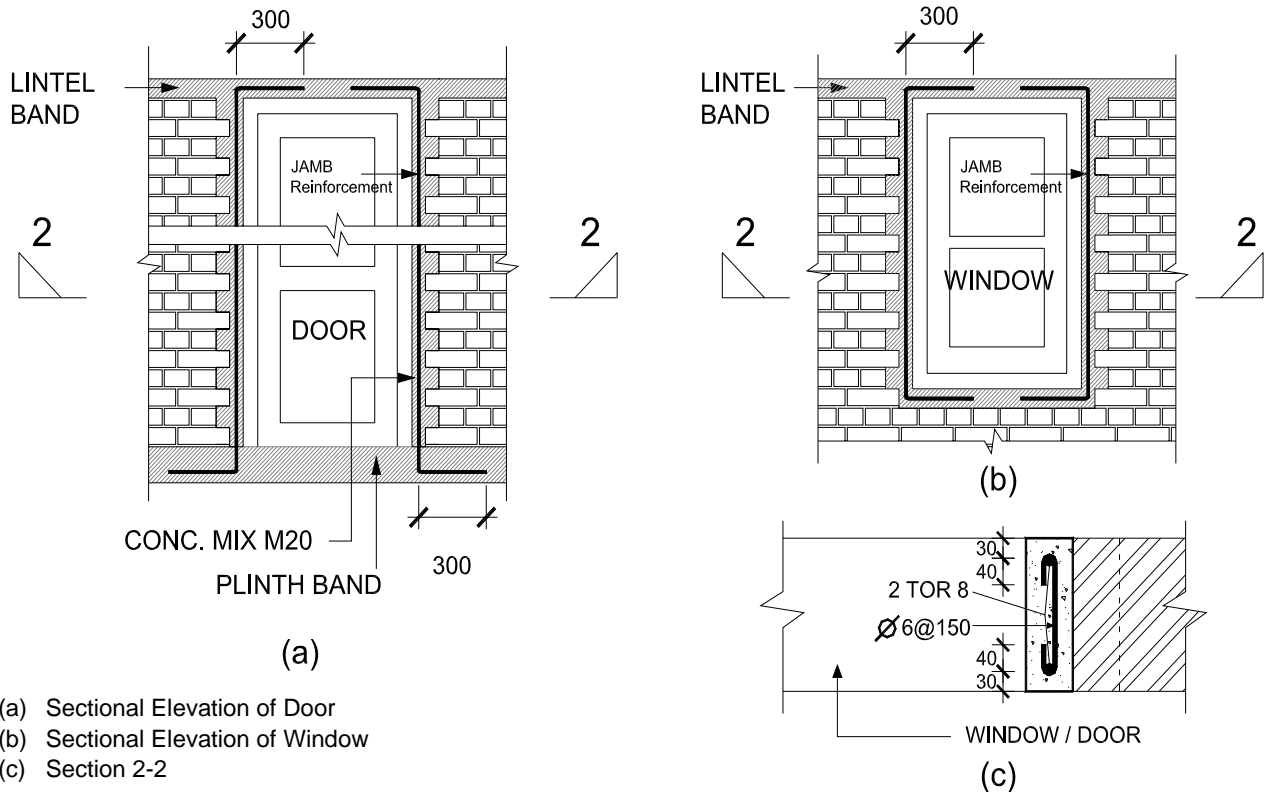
Typical Details of Providing Vertical Steel Bars in Brick Masonry
